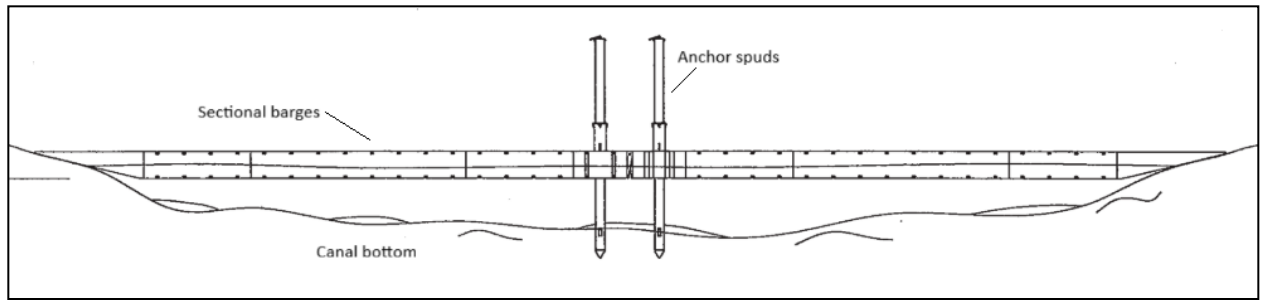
Cross Section of Proposed Temporary Pontoon Bridges
